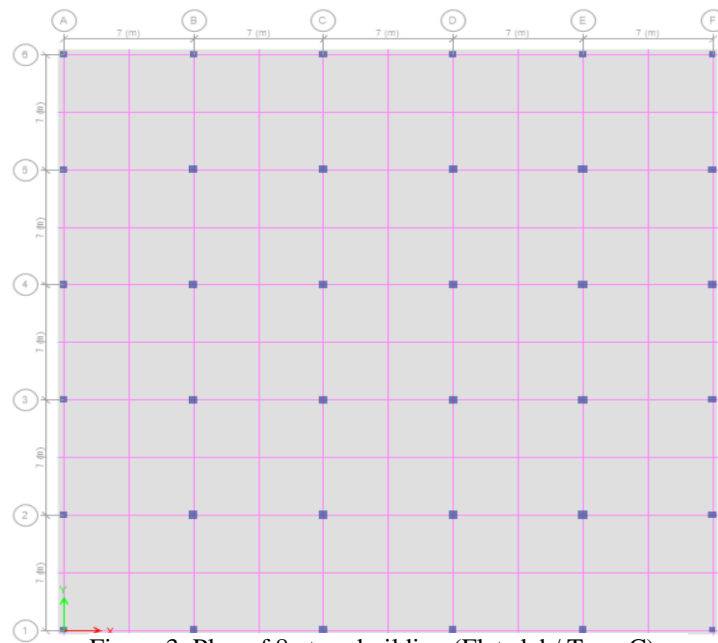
Plan of 8-story building (Flat slab/ Type C)
